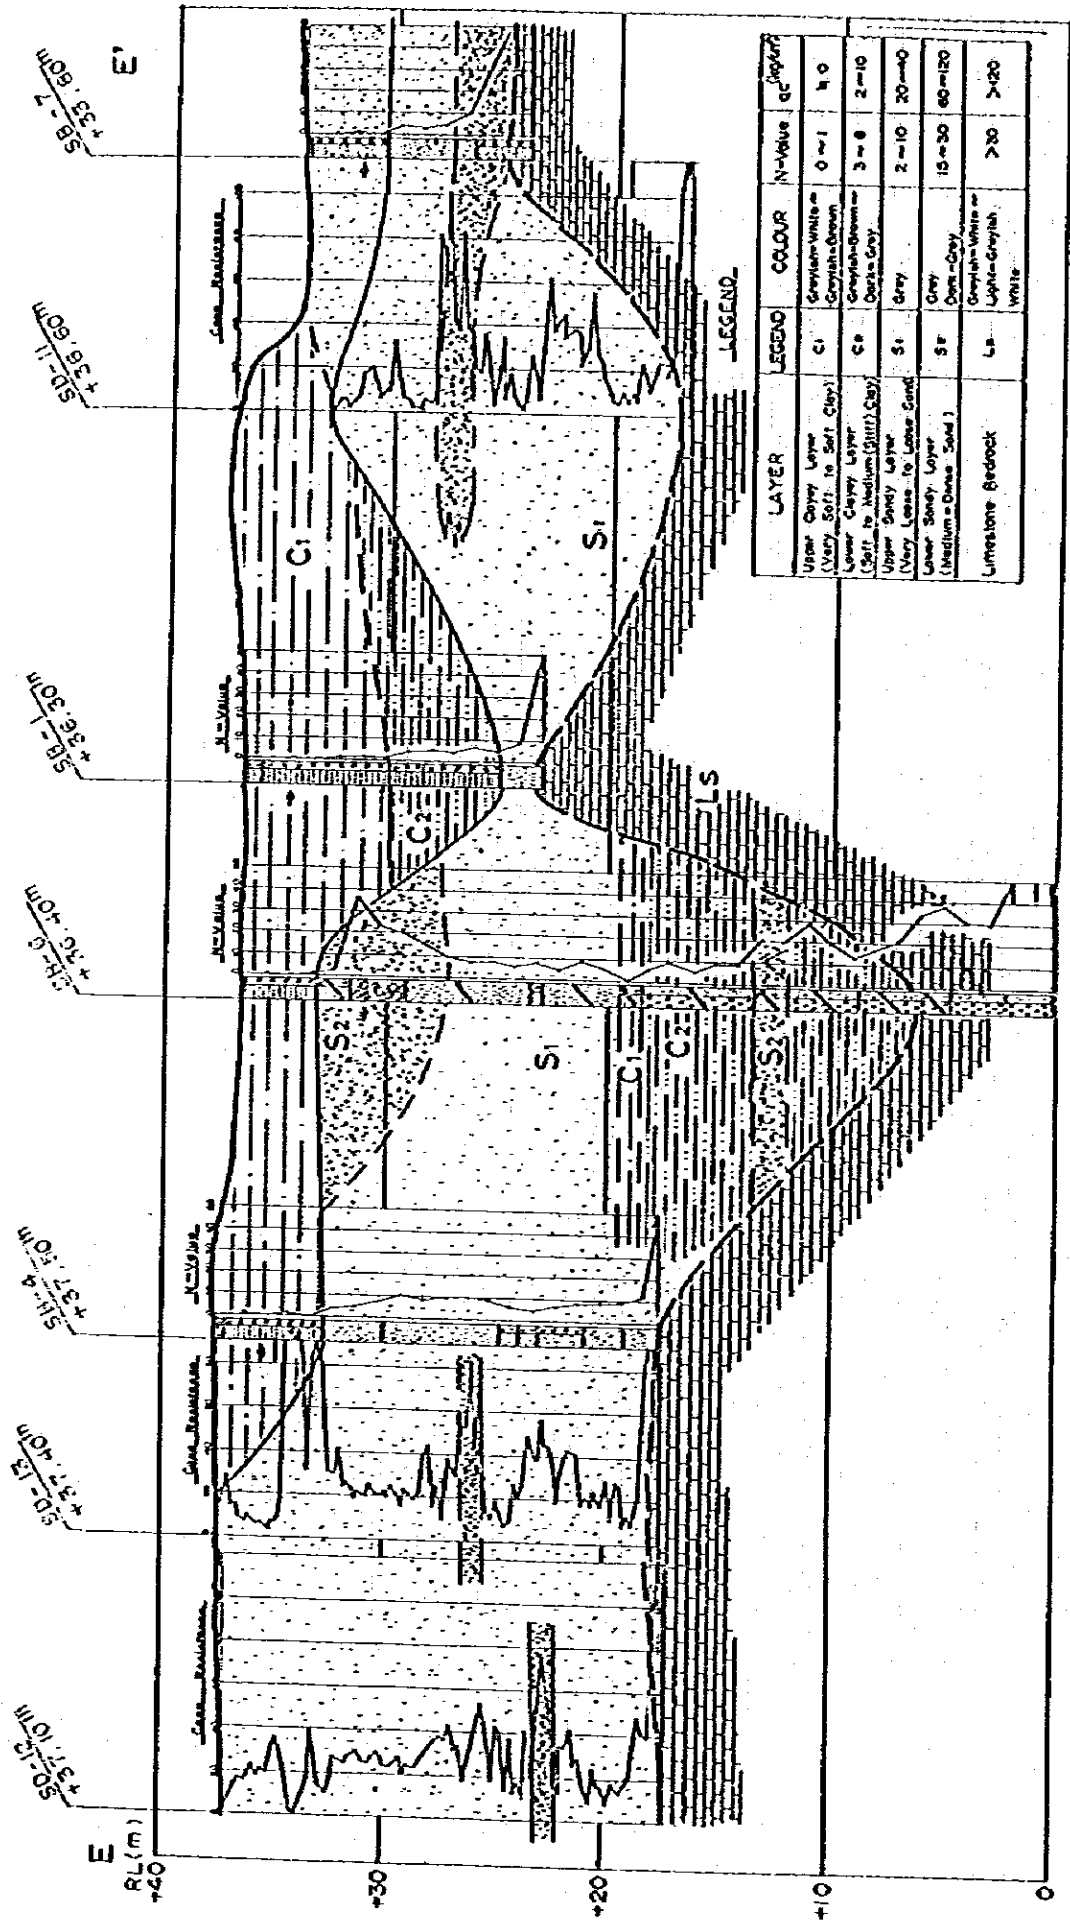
Soil Profile at Sentul, Cross Section E-E'
